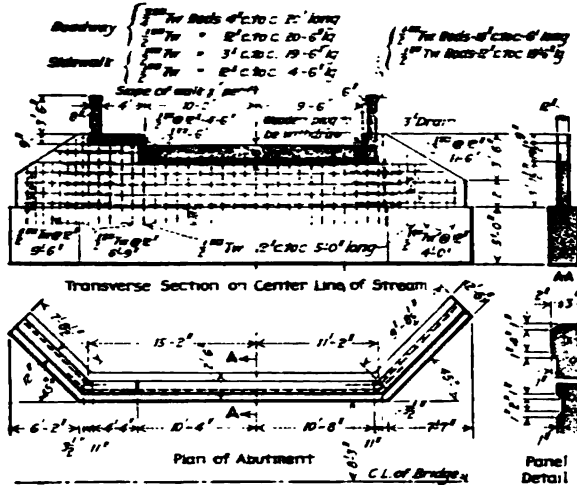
Details of Christians bridge, Town of Cross Plains, Dane County, Wis.
